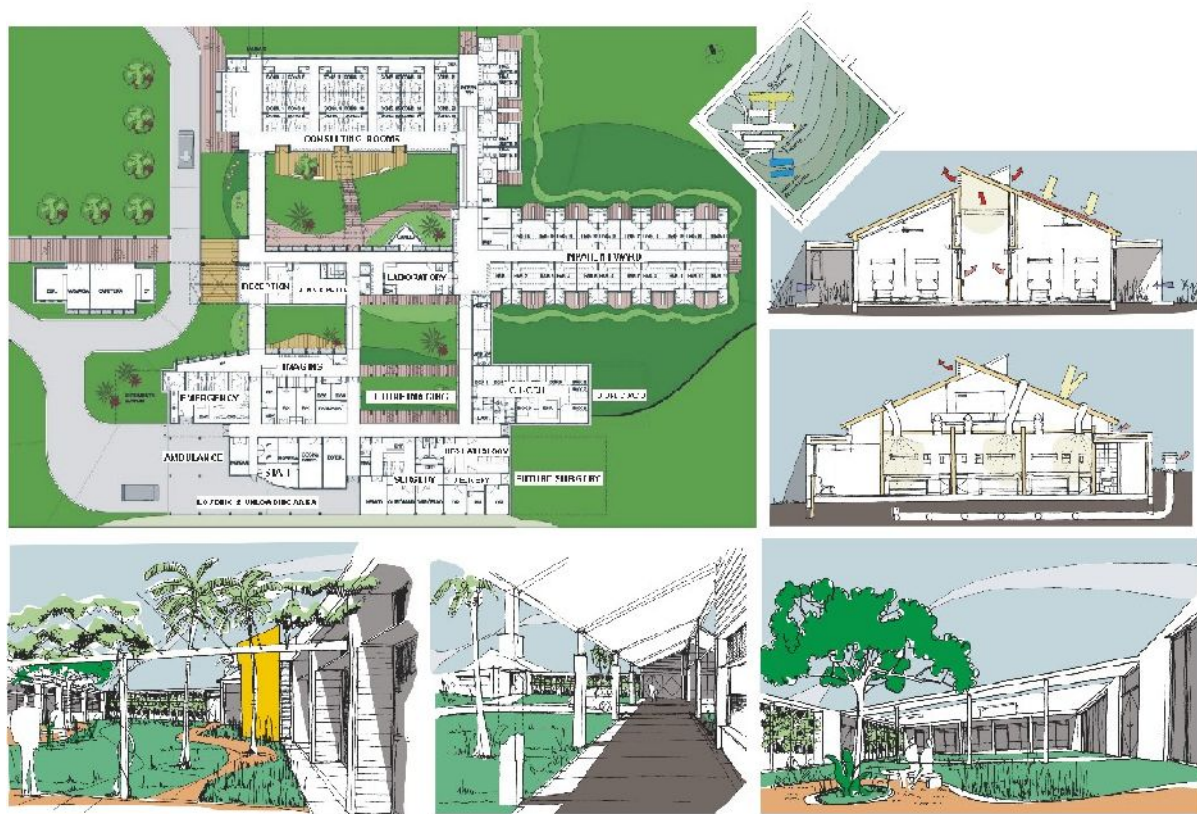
Oberá Clinic. Main floor layout, typical sections and exterior spaces.
